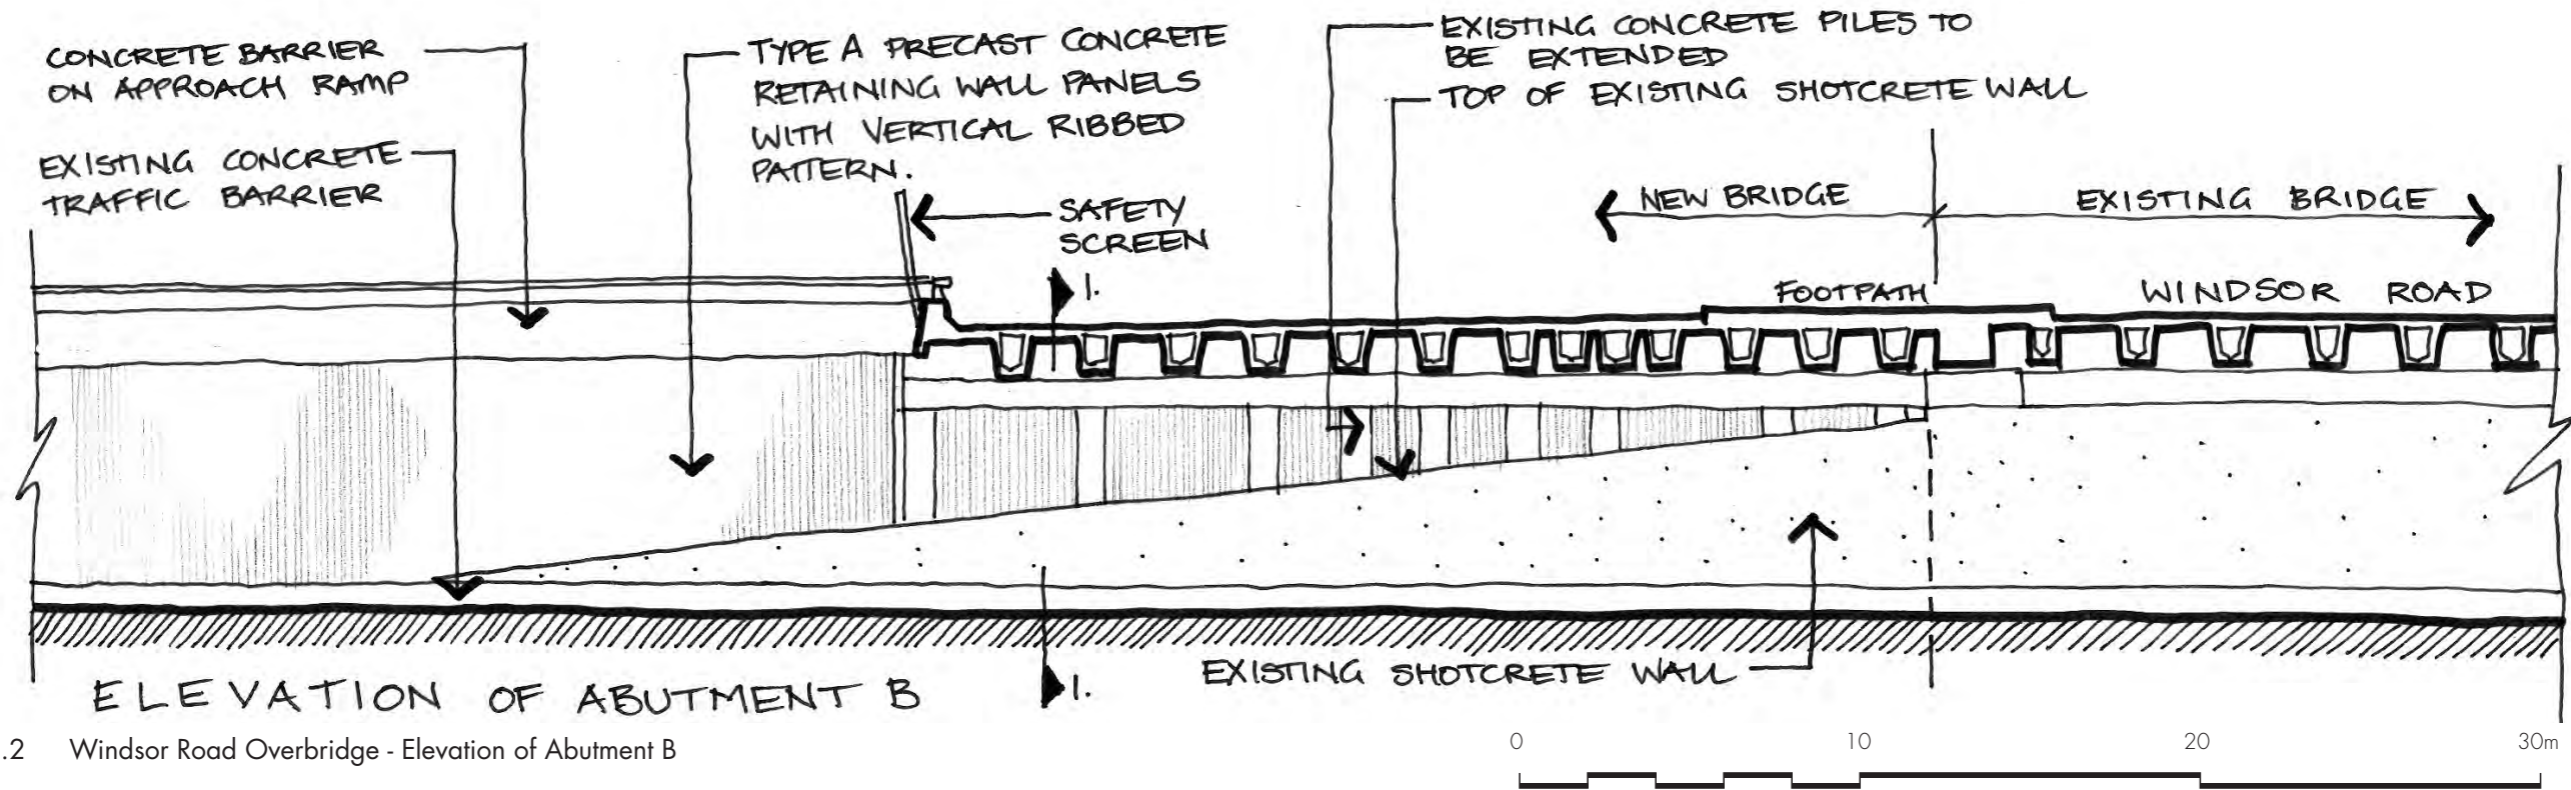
Windsor Road Overbridge - Elevation of Abutment B
